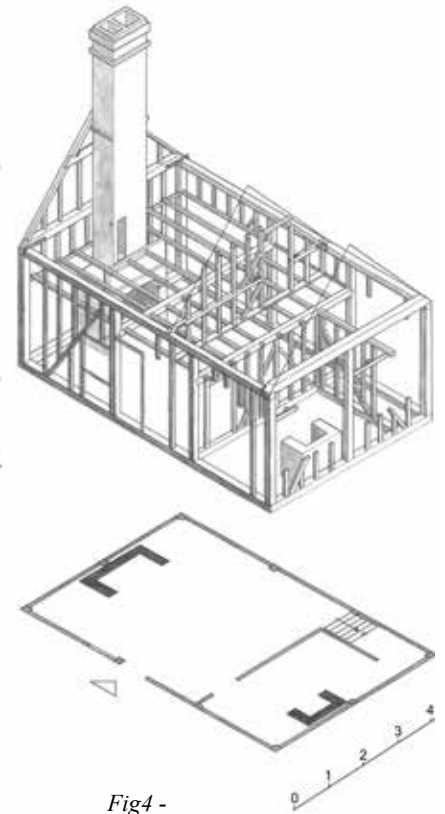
Isometric reconstruction of Tudor Cottage, Bradwell on Sea
